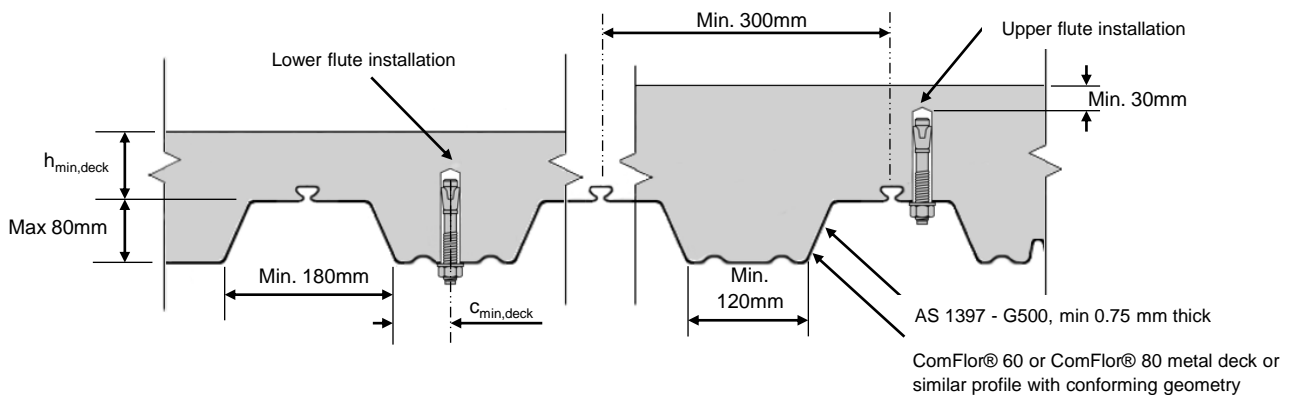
Hilti HST3 in the soffit of concrete filled open trough profile steel deck assemblies
